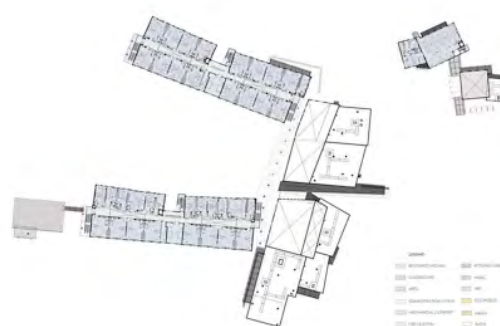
Show Typical floor plan of the school. Source: DesignShare, 2008.
